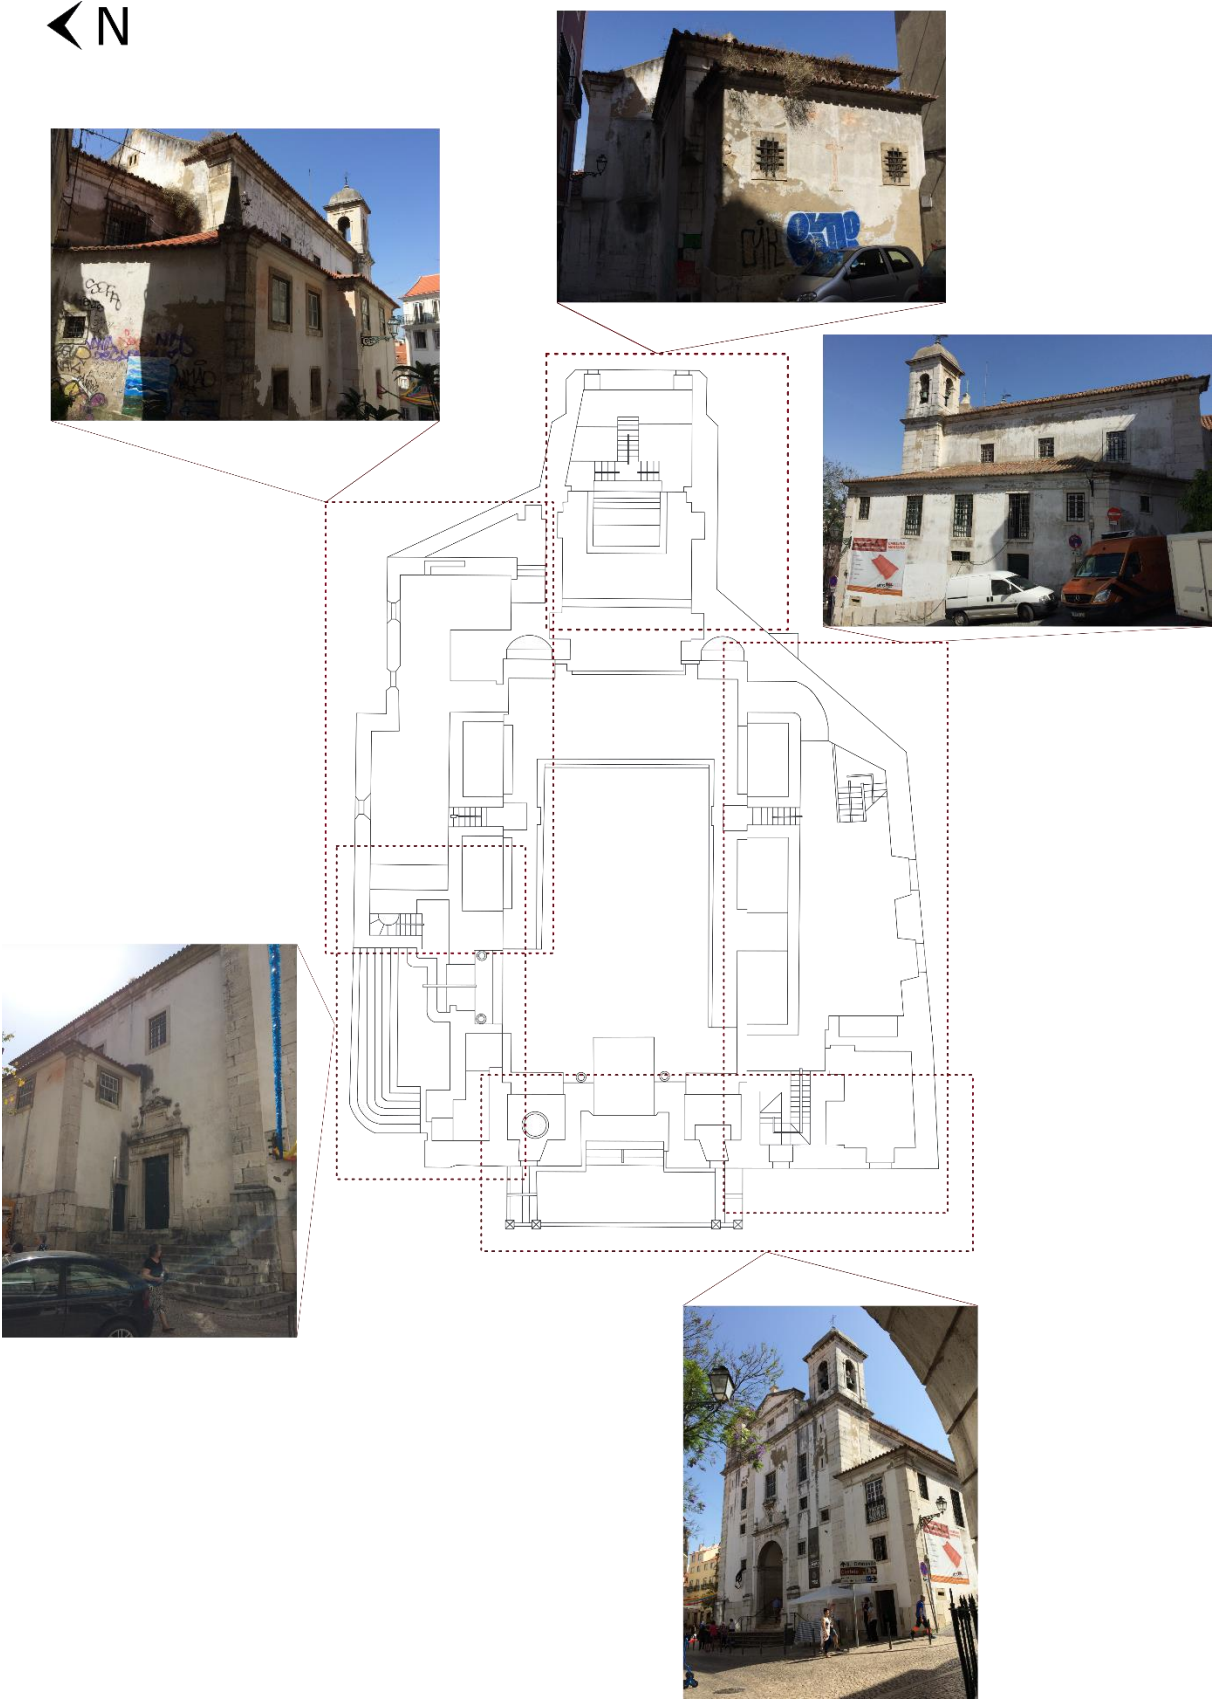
St. Cristóvão church plan with photographs for each zone of the building
